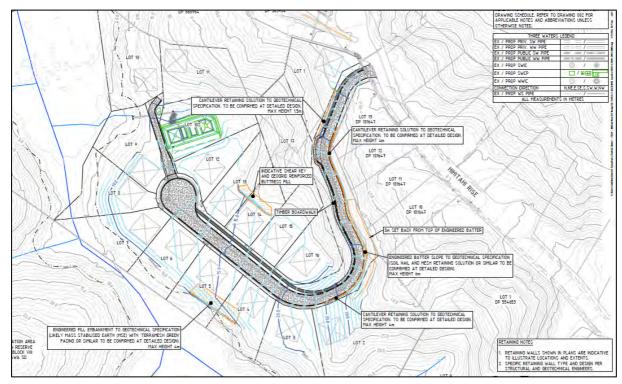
Indicative Location and design details of the proposed retaining walls- Refer to Appendix 5.
